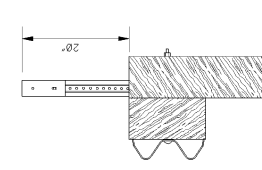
DETAIL OF SINGLE WHITE OR SINGLE YELLOW DELINEATOR
